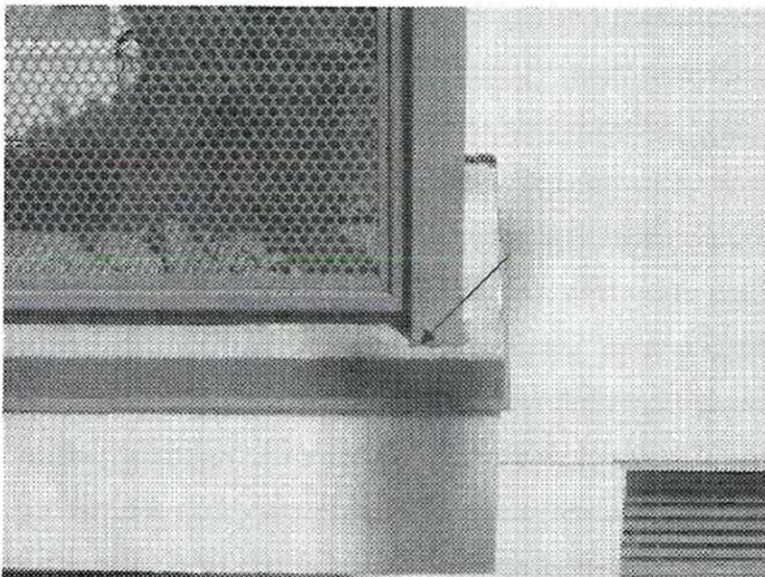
Spalling of concrete at balcony where railing does not appear to be fully coated.
